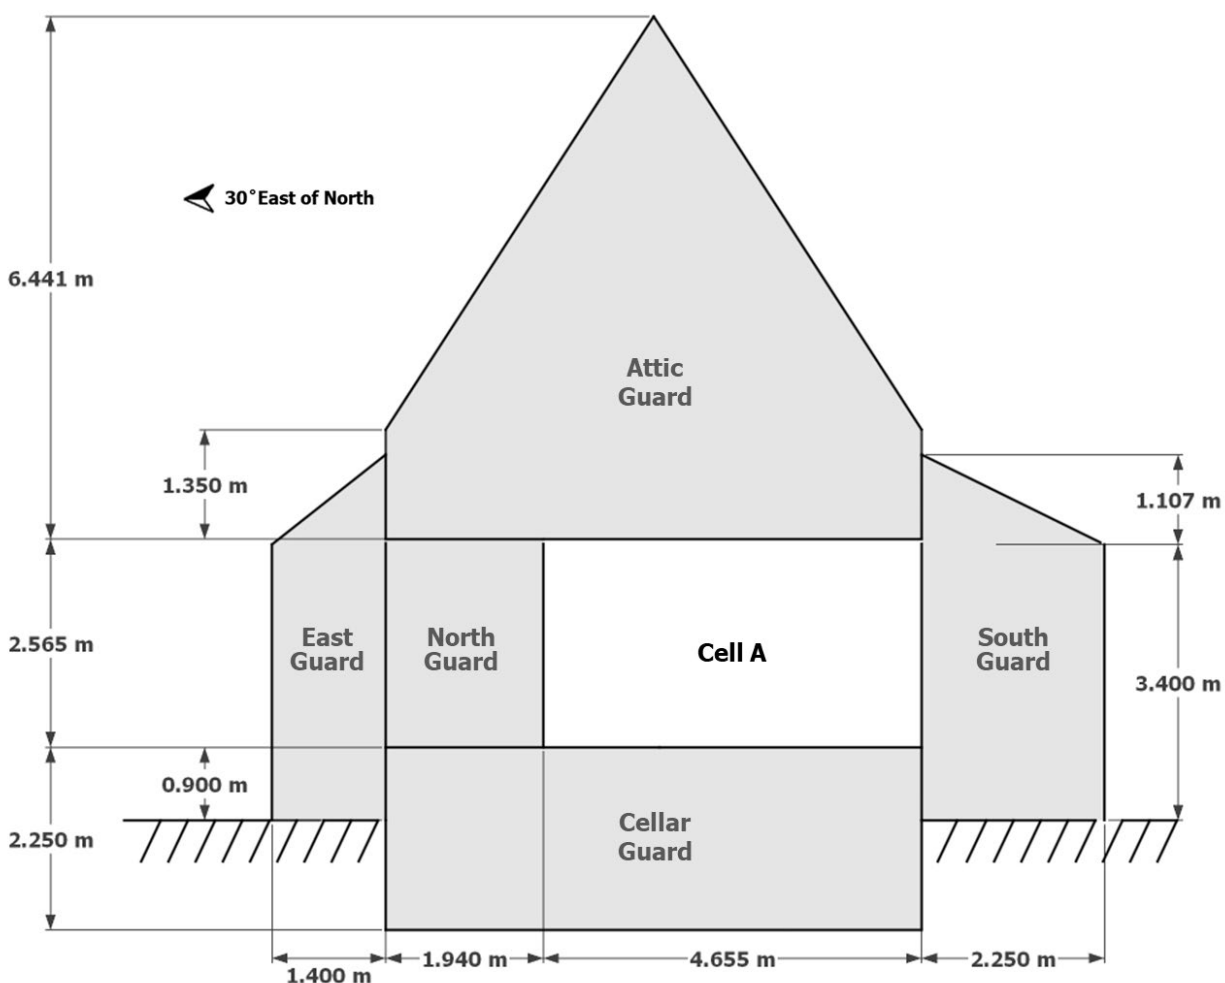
Alternative summary geometry with guard zone dimensions: Cell A elevation section looking 30° north of west through page
